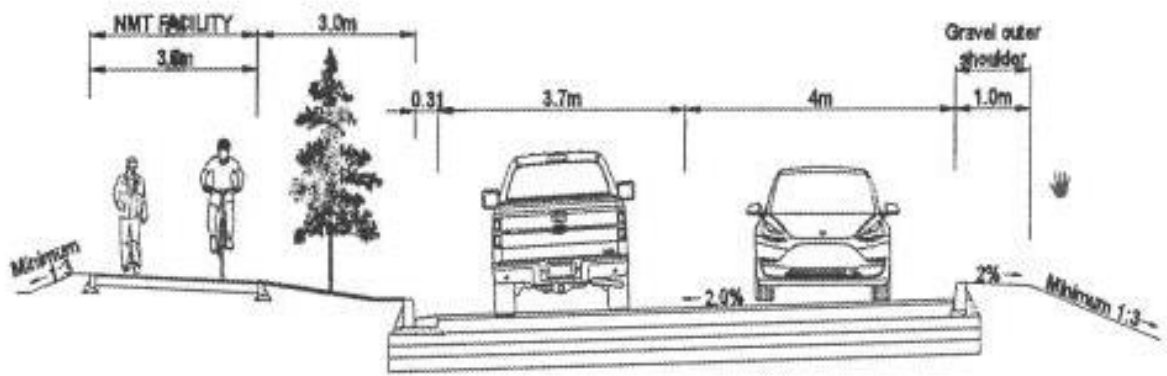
Typical section of Wildebosch extension (RMP, 2023)
